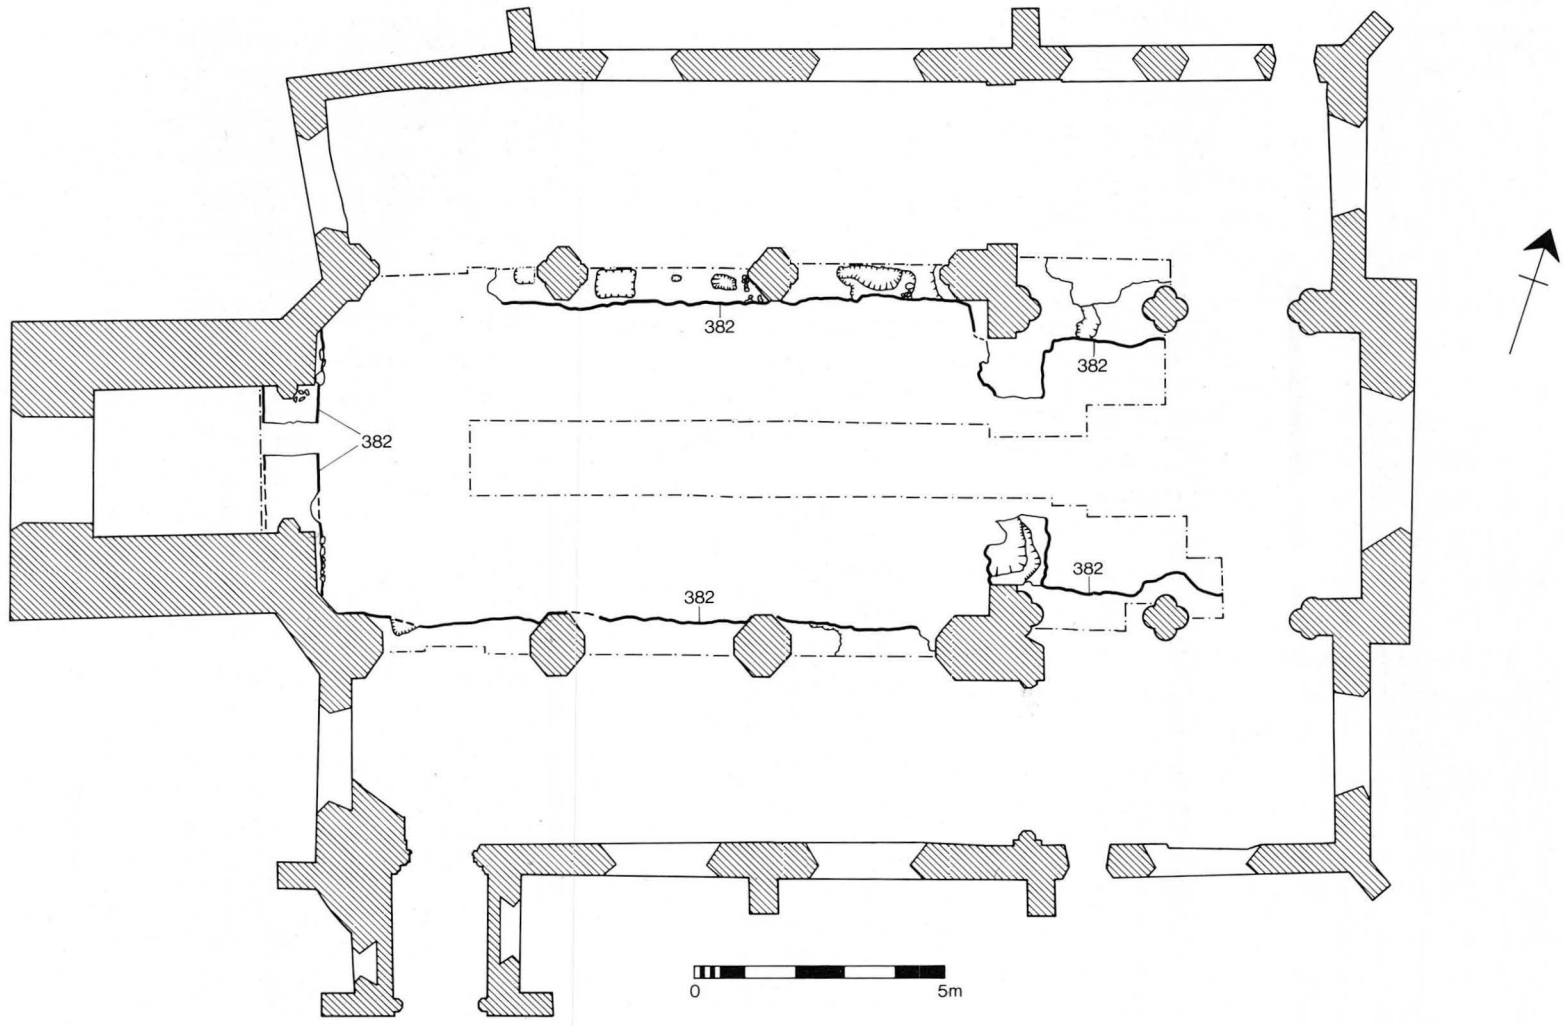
Period III, Structure C foundation plan. Scale 1:150
